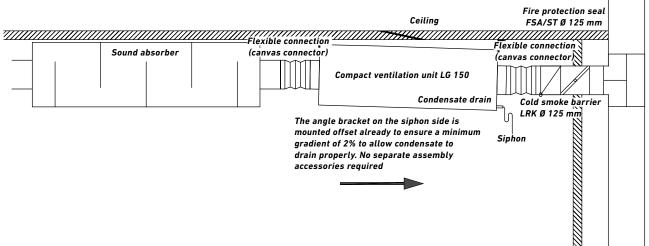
DETAIL CONDENSATE CONNECTION WALL SEE PAGE 17
